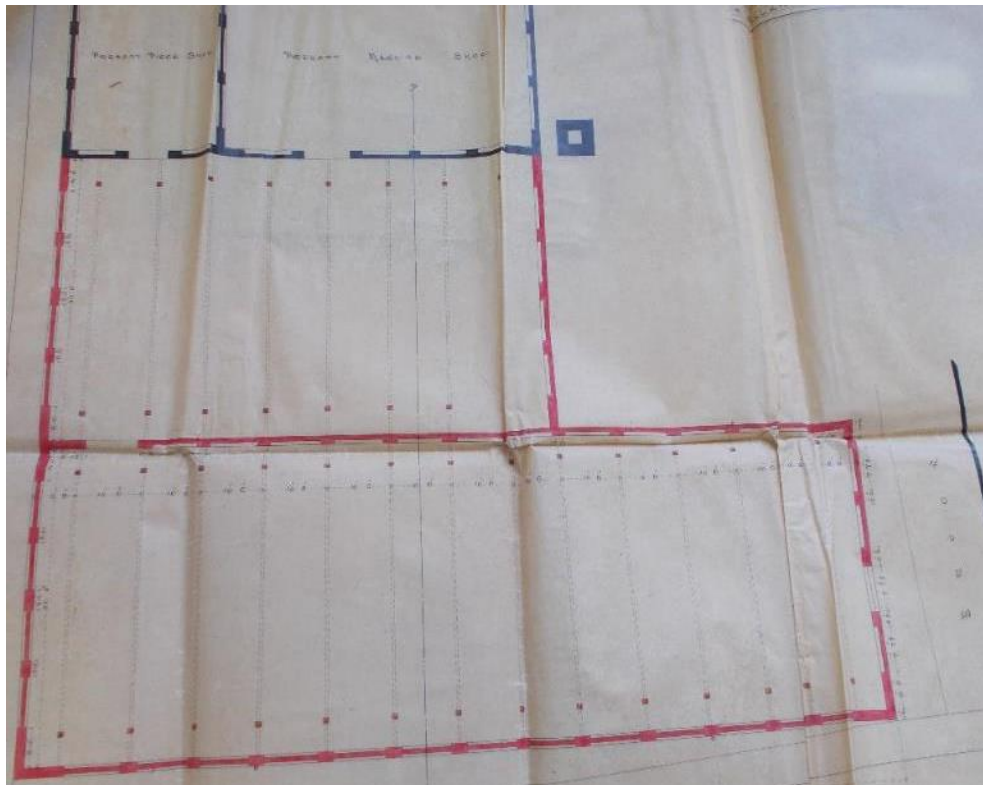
Plan of 1897 showing detail of buildings now largely occupied by Building 6 and Building 7
